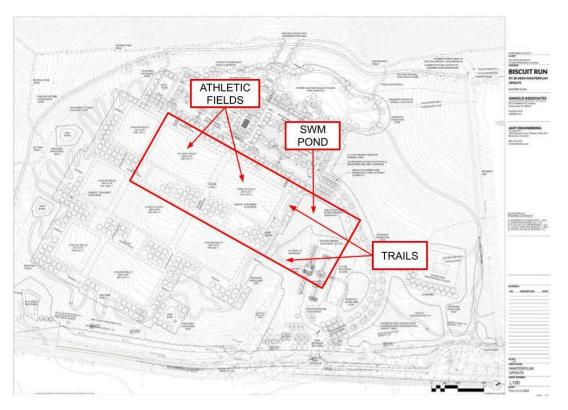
Phase 2 Master Plan for Park with Design Area of Interest
